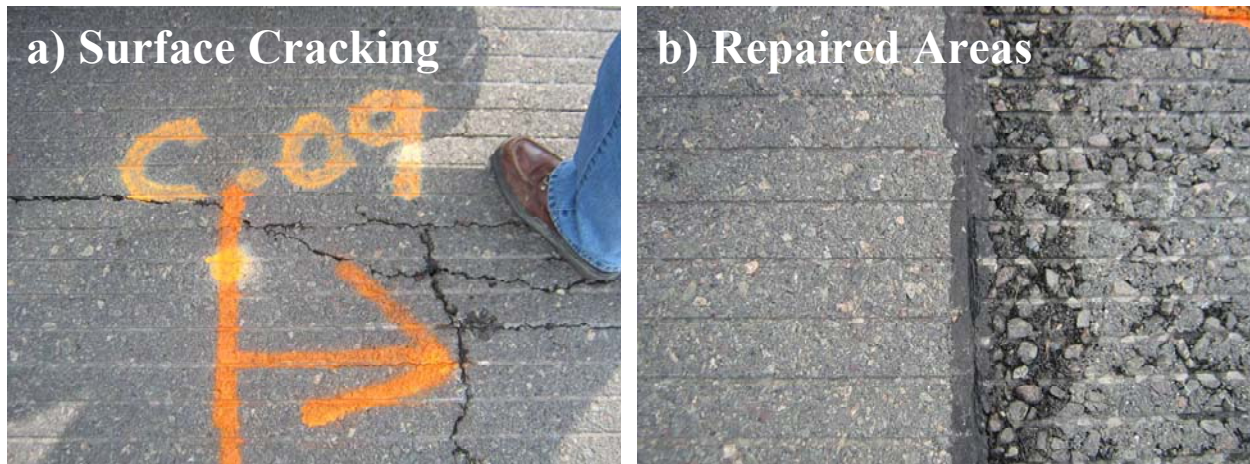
Surface Cracking and Areas with Different Surface Pavement on Section 1
